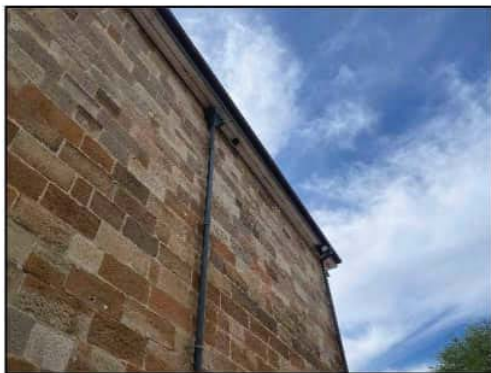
External view to the sandstone masonry with a lightly picked finish on the southern elevation, featuring a copper downpipe.
